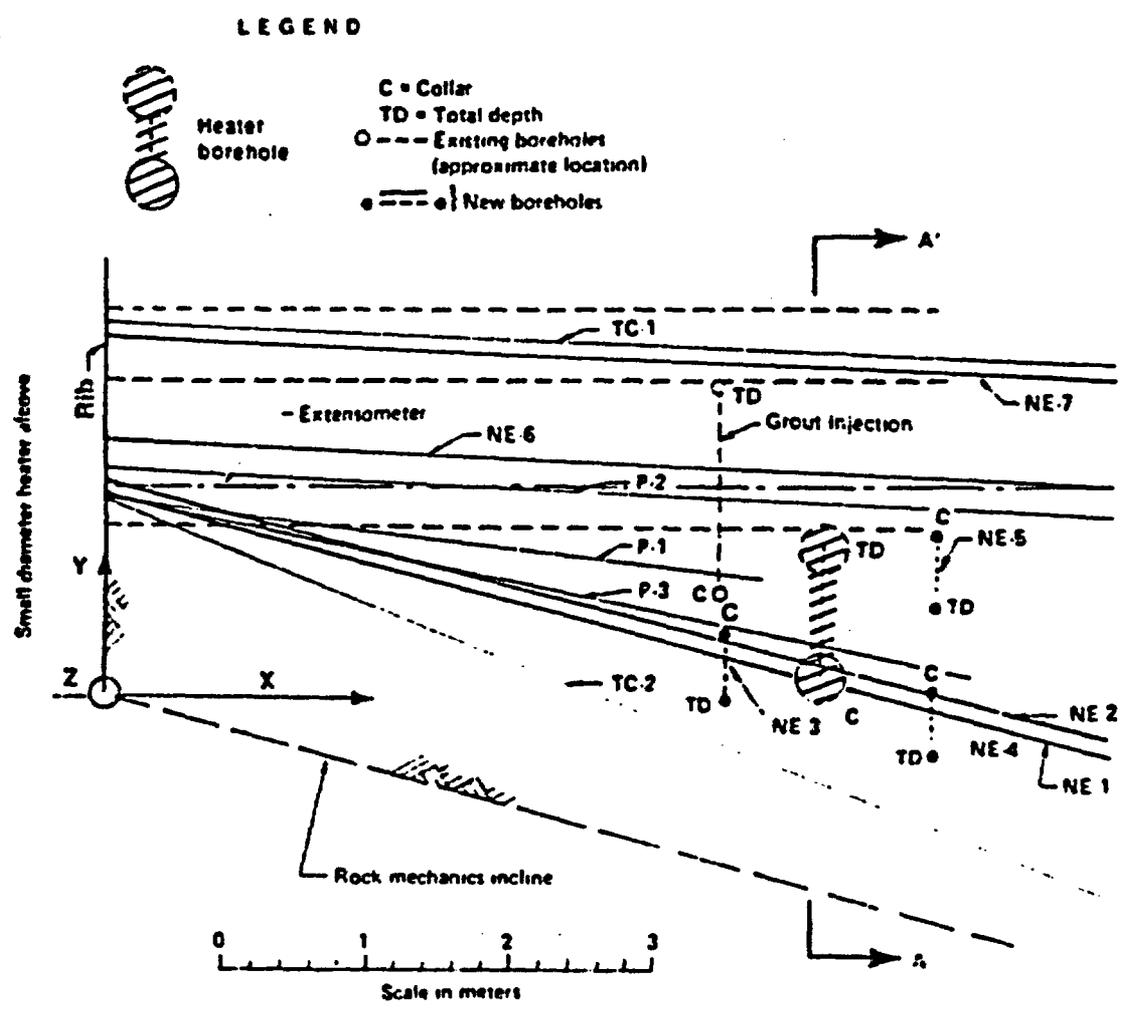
L-4. Cross section view of the planned borehole layout. This view is parallel to the azimuth of the "Rock Mechanics Incline."
